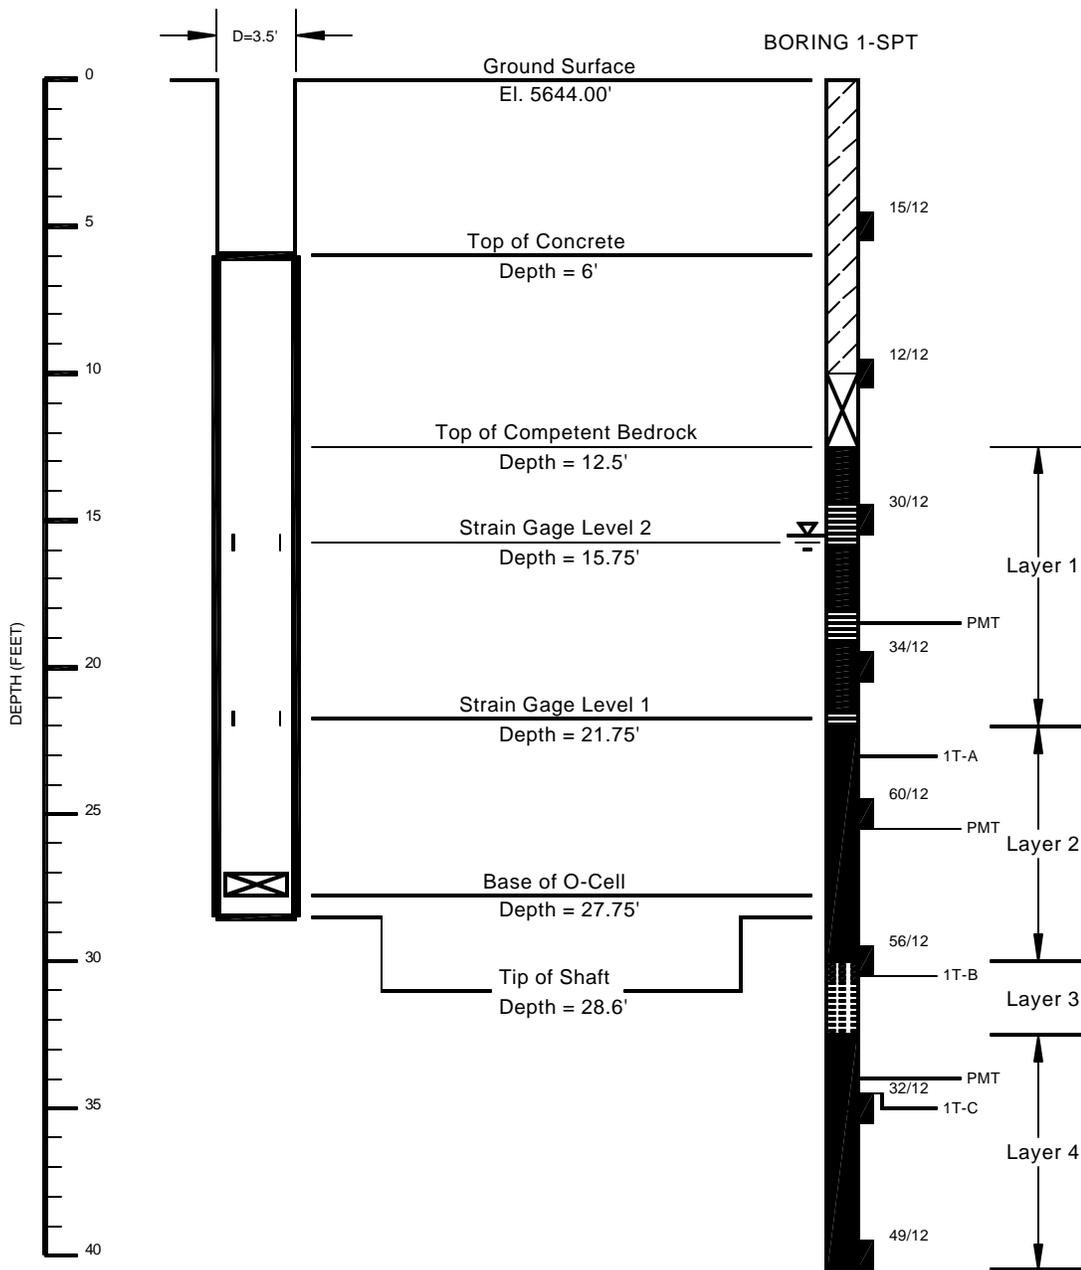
Instrumented Test Shaft Schematic and Boring Logs for I-225 Site
